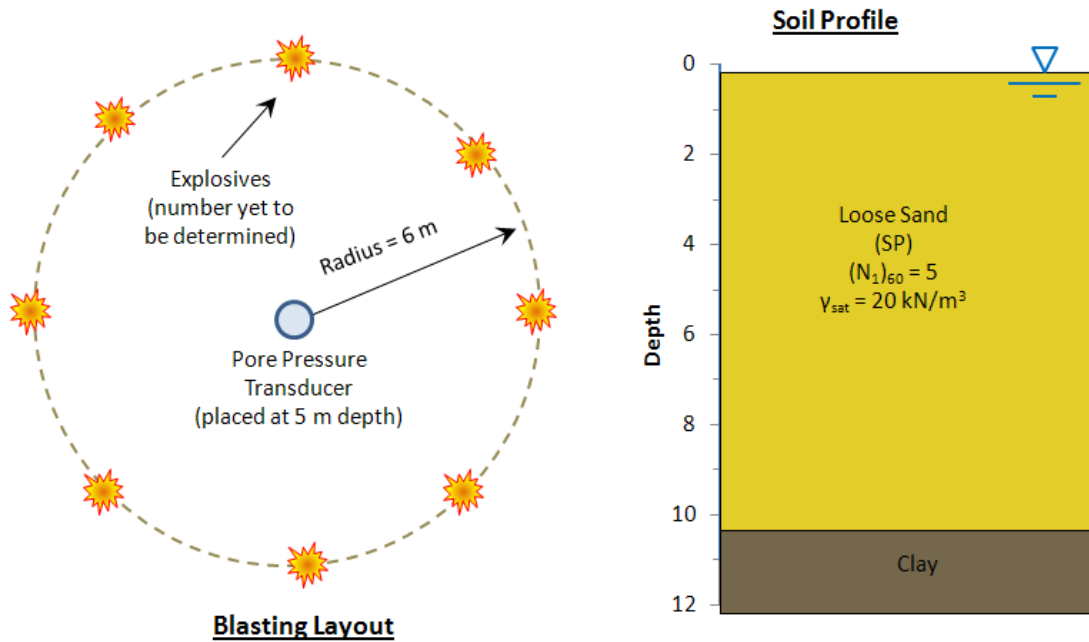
Blasting Layout and Soil Profile used for Example Design Problem
